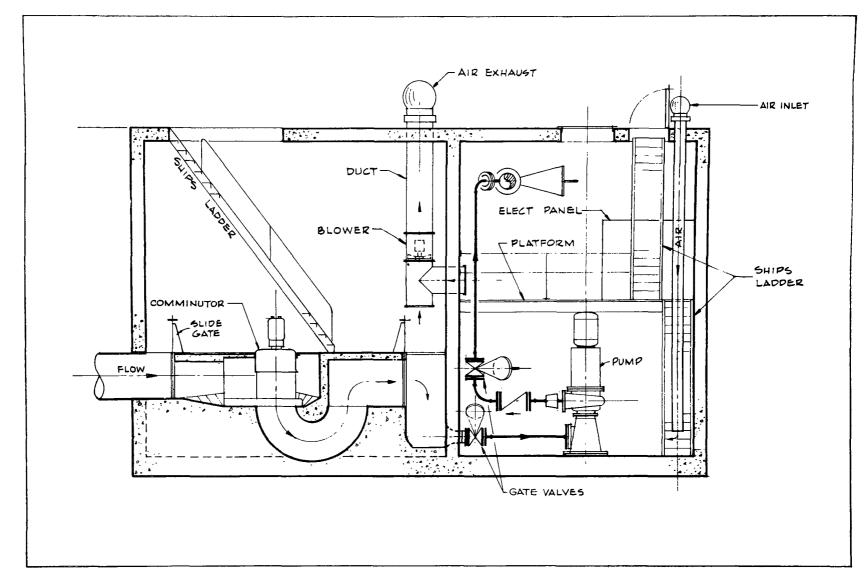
ELEVATION OF LARGE GRINDER-PUMP STATION
